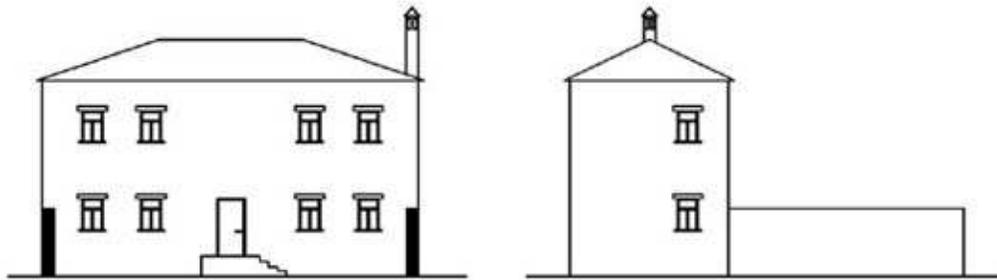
House type 1: Front side elevation (left) and left side elevation (right) (Drawings by author)
